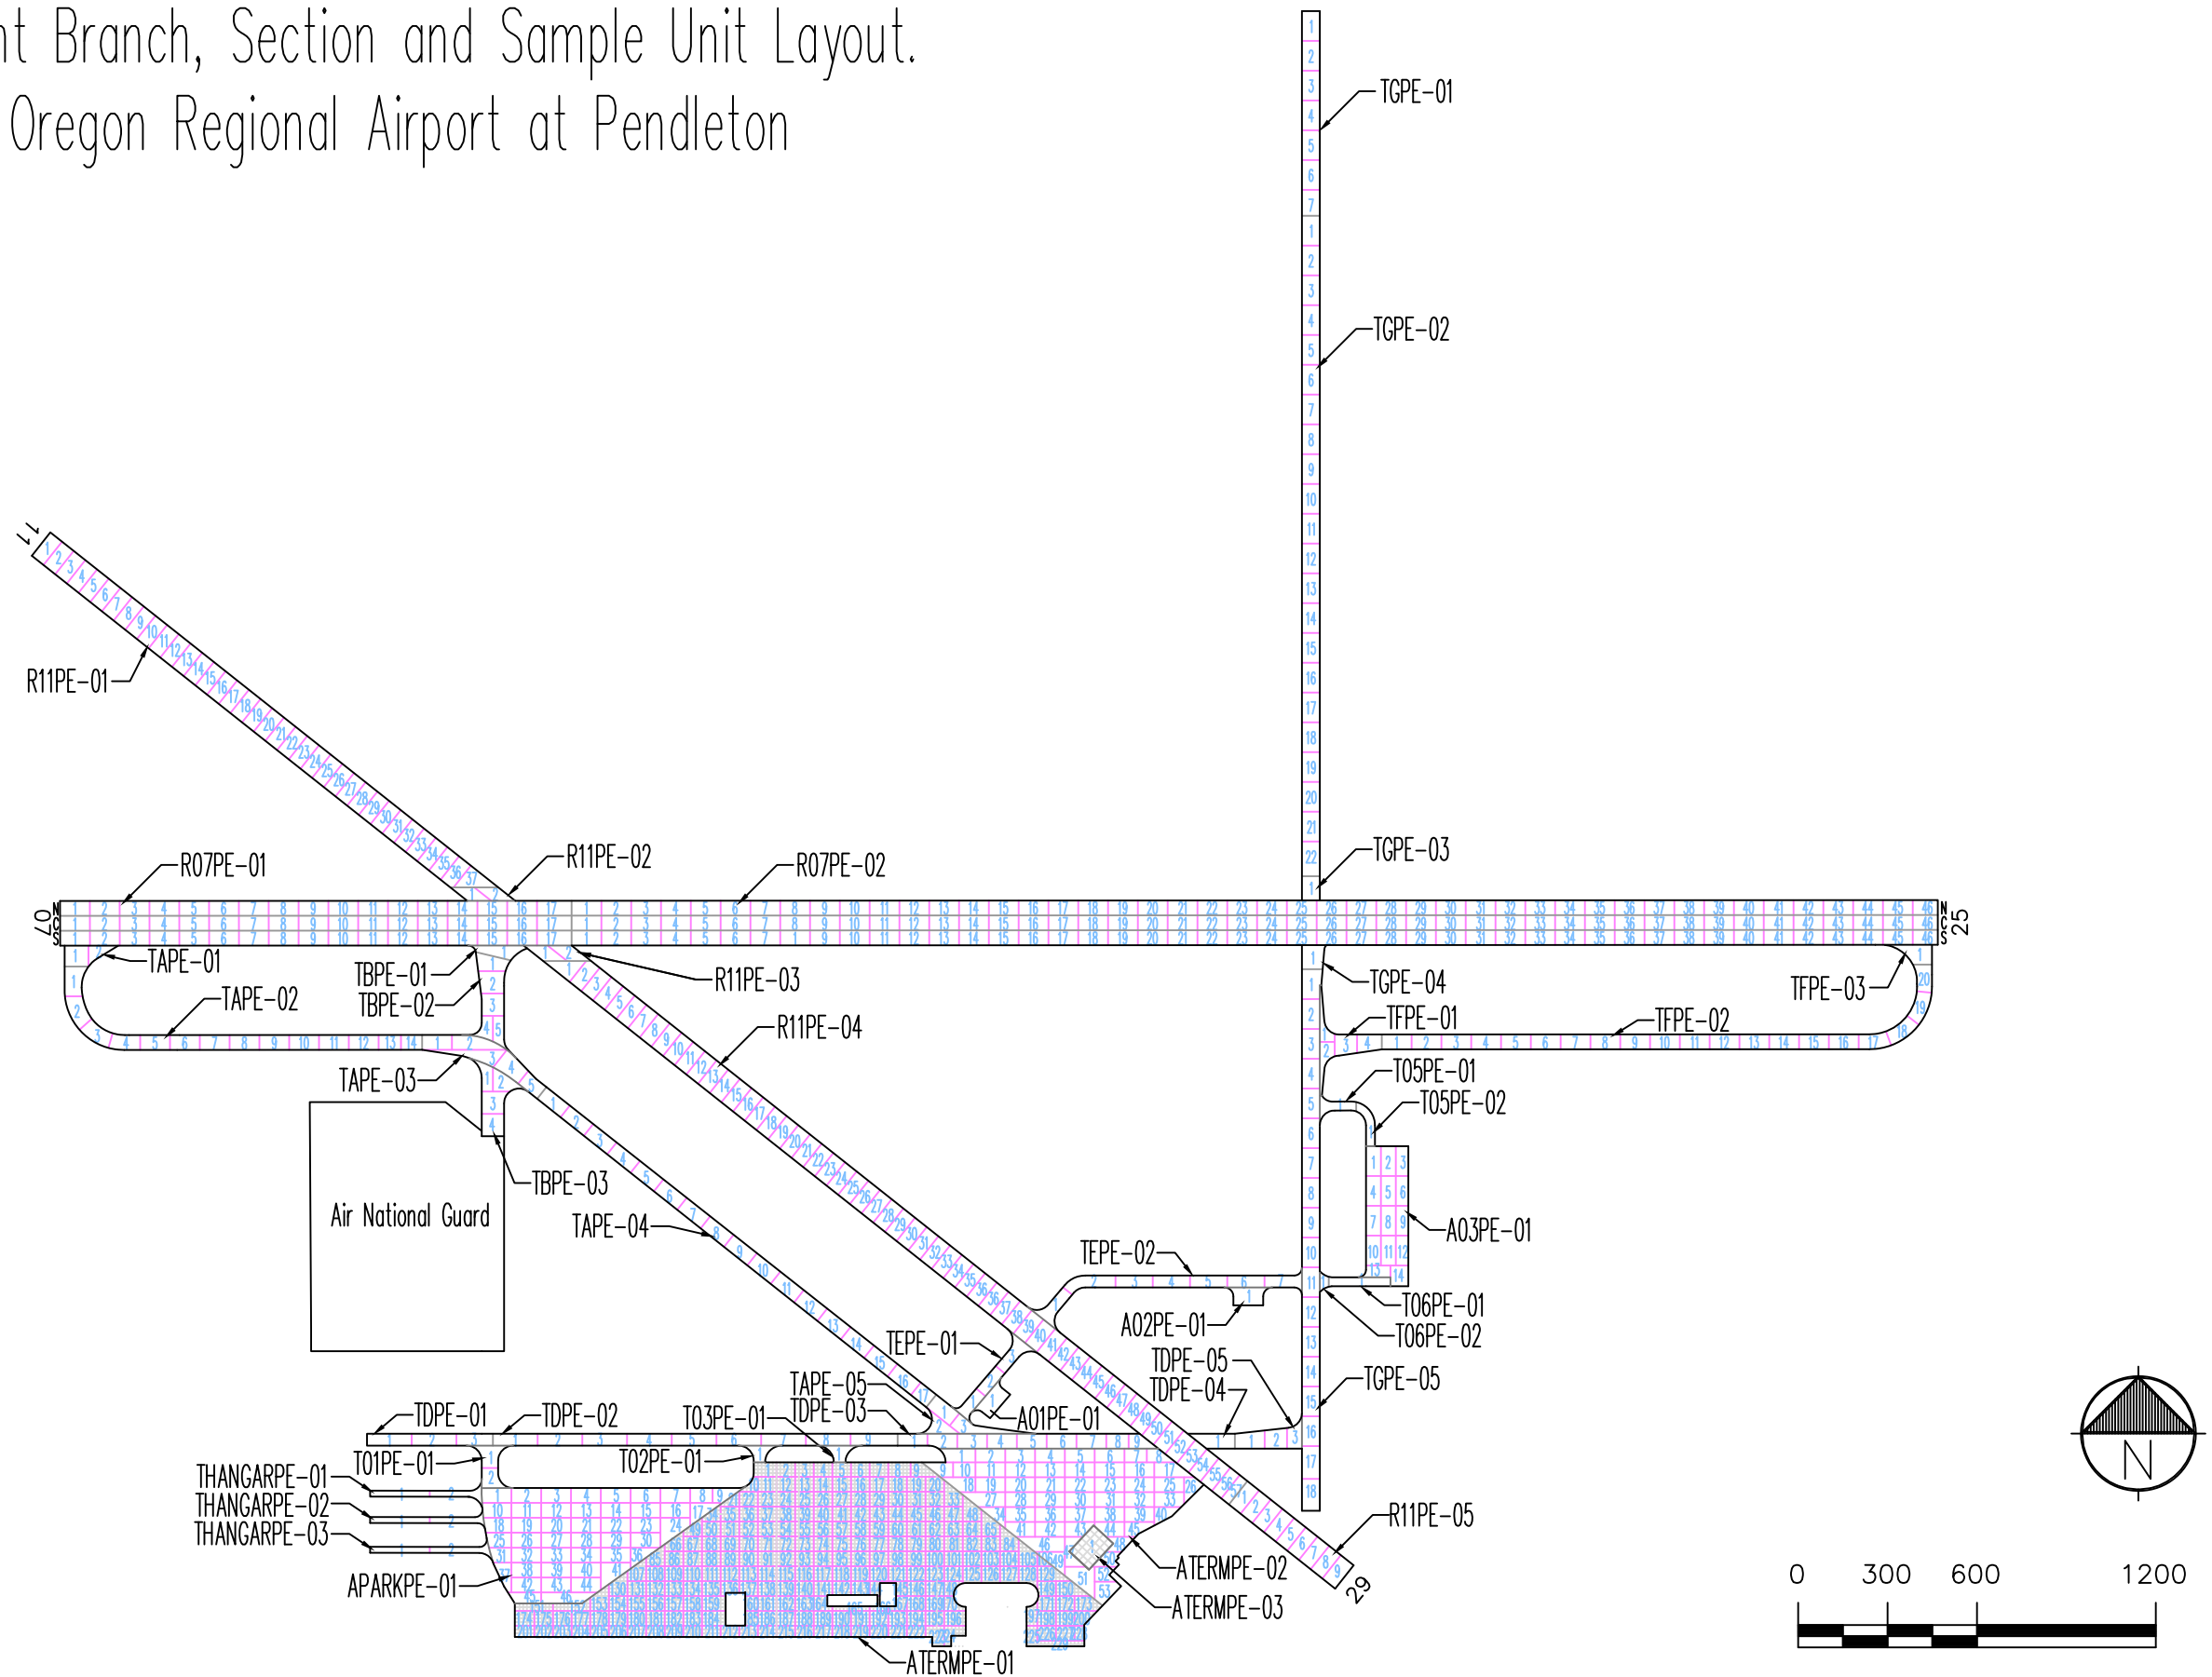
Pavement Branch, Section and Sample Unit Layout.
